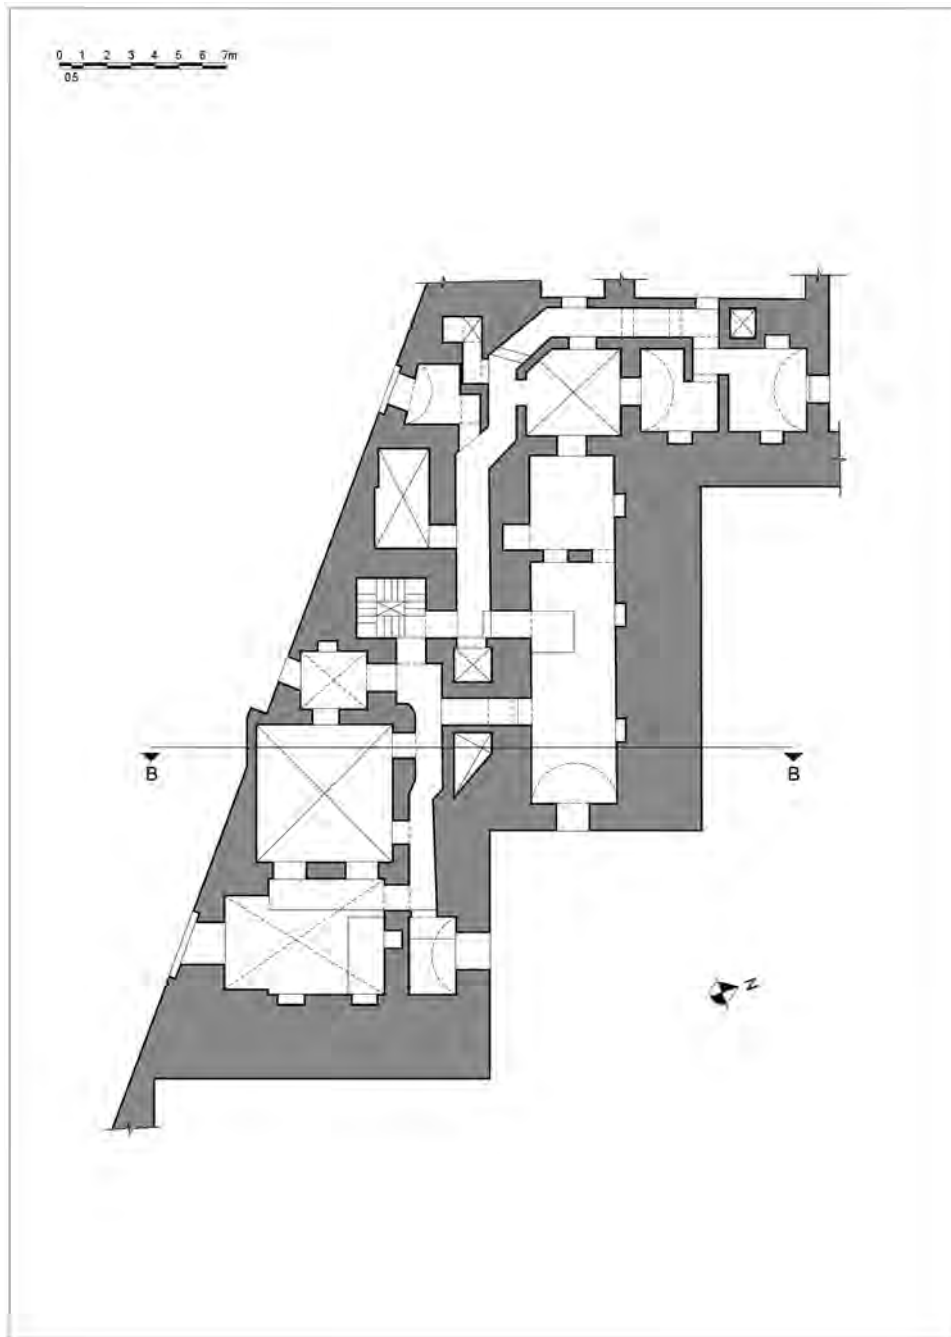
Ḥanbaliyah Madrasah, Complex of Sultan Ḥasan, Cairo, third floor plan (H. Al-Harithy)
